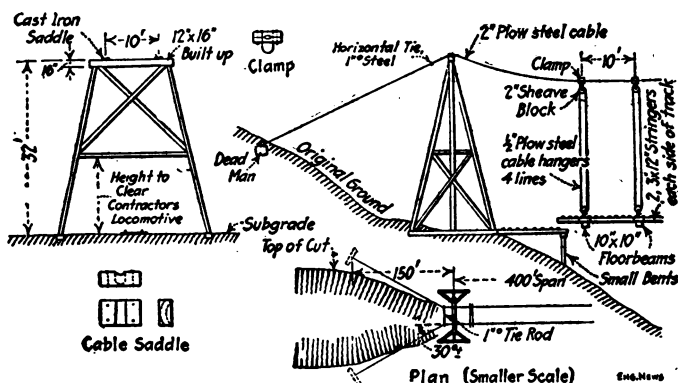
Suspension Dumping Bridge for Building Embankments; Louisville & Nashville R. R.
